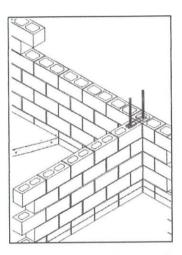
Starter Bar at Corner of wall (Source: Modul Pemasangan CMU Projek PPR Tanjong Karang)
